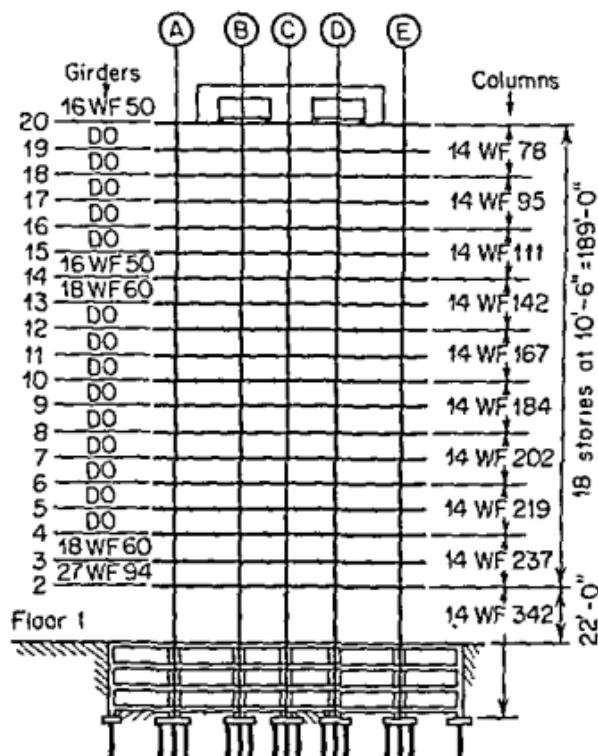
Schematic elevation showing column and girder sections of a multi-story framed structure.
